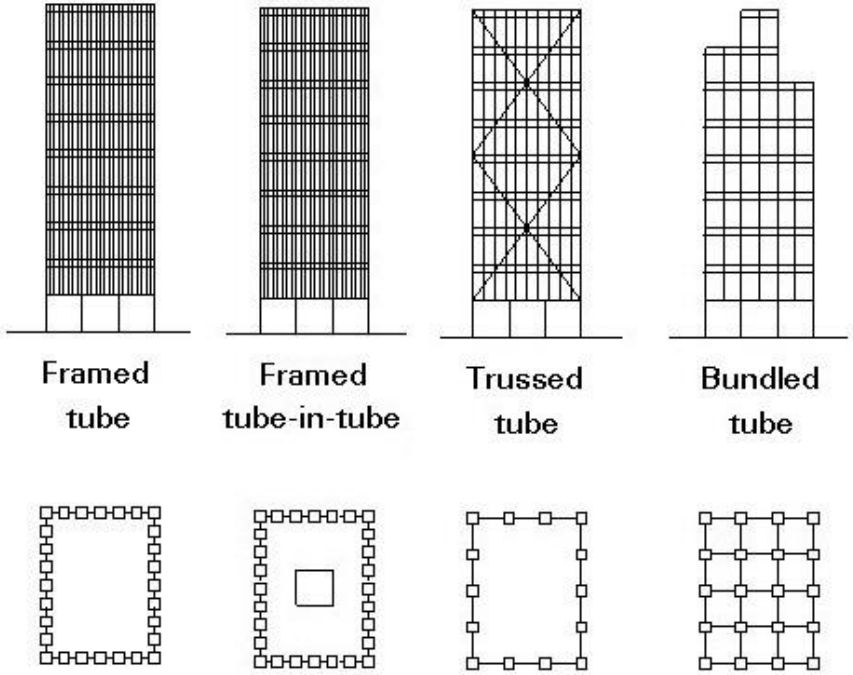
Different “tube” structural systems for tall buildings. The World Trade Center is an example of a framed tube, the John Hancock center a trussed tube, and the Willis Tower is made up of a bundled tube. Figure from [p, 12].
